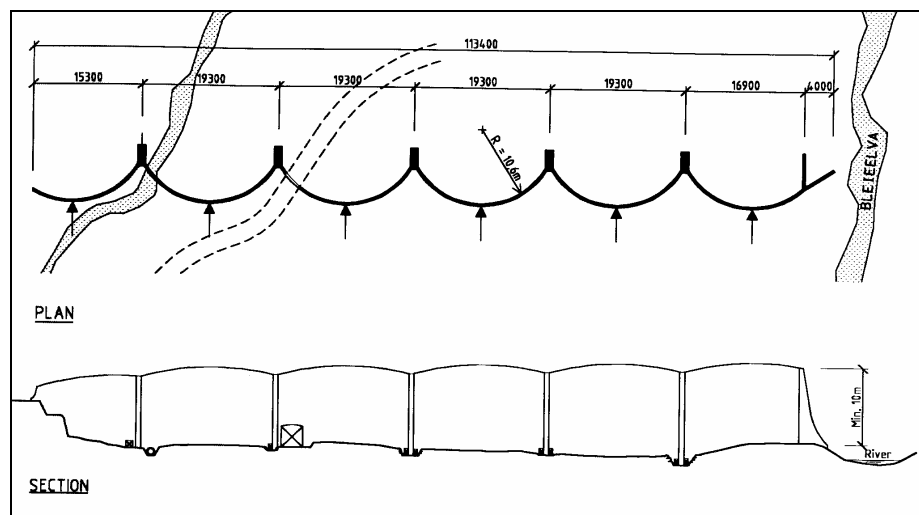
The wall consists of five-and-a-half half-cylindrical shells monolithically connected to form the 113.4 m long wall
